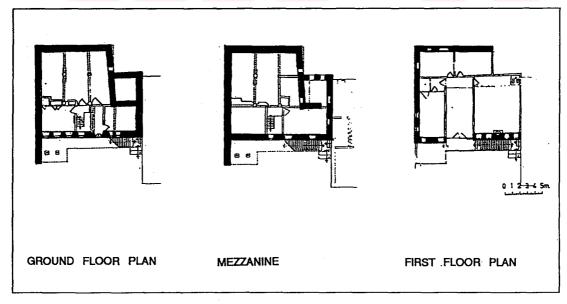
Use of Masonry Service Wall in Upper Floors, (Şahin, N., Morçöl, E., 1993).
